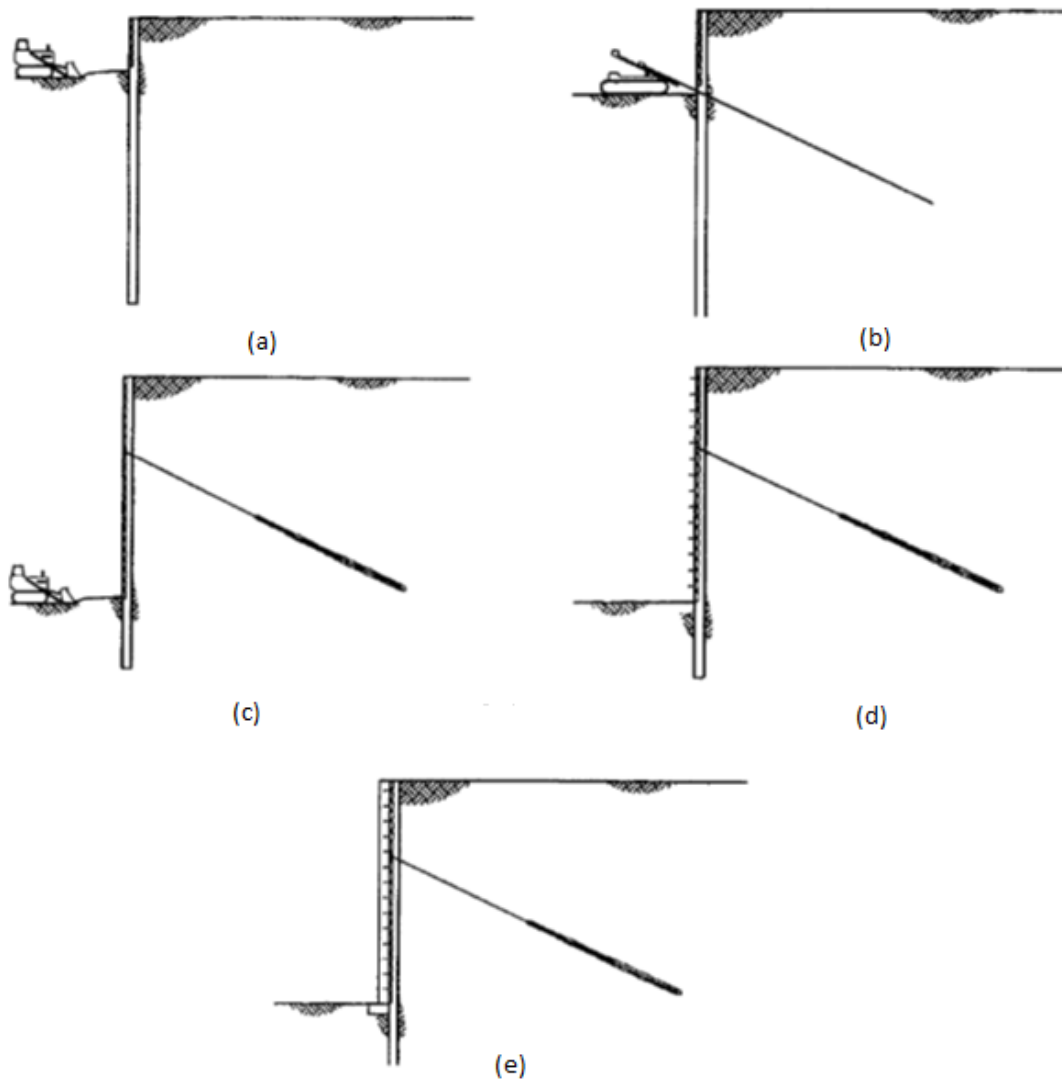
Excavation-anchor installation sequence. (a) Excavate and install support system; (b) install ground anchor; (c) complete excavation; (d) install headed studs and prefabricated drainage; (e) Install cast-in-place or precast facing wall. (Long et al., 1998).
